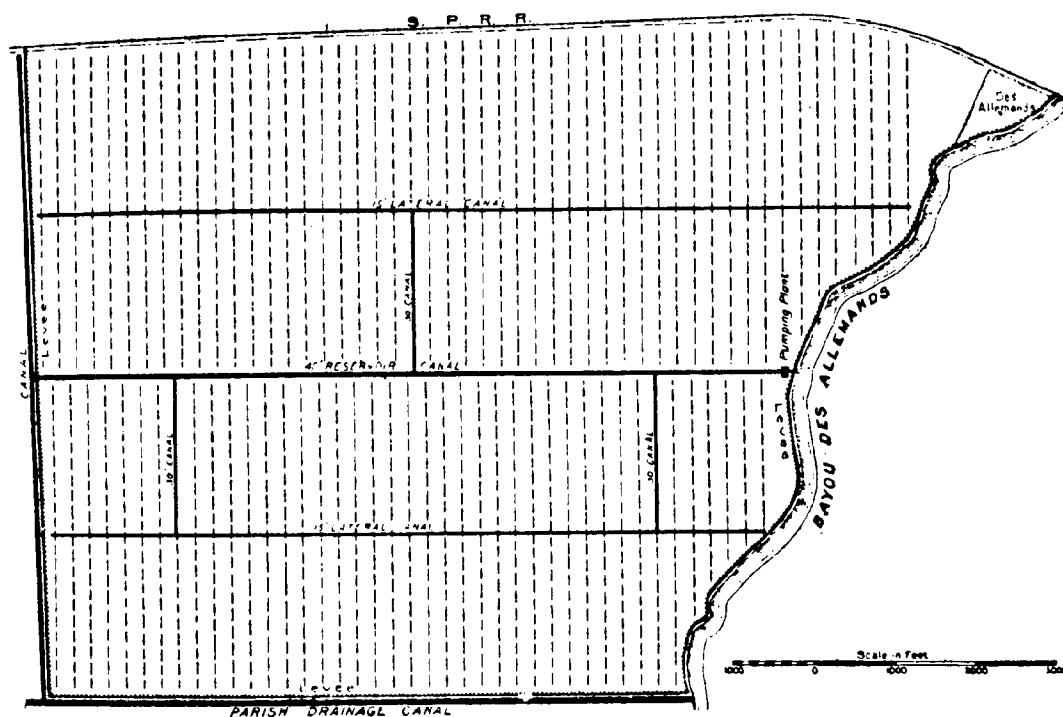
Arrangement of levees and ditches in the Des Allemands Drainage district. (After Okey, 1918)
